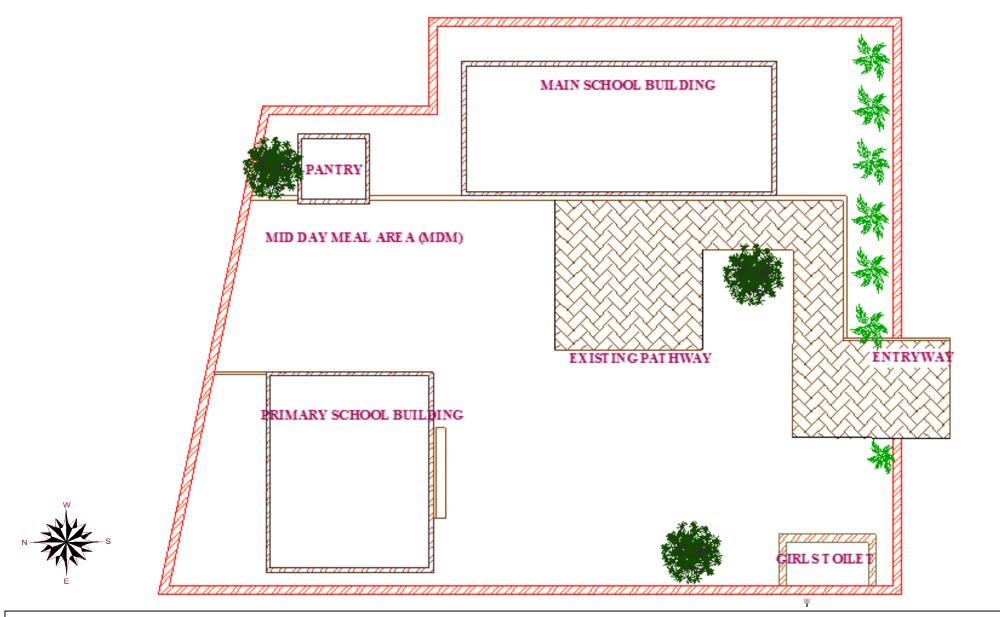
EXISTING FLOOR PLAN OF THE SCHOOL
